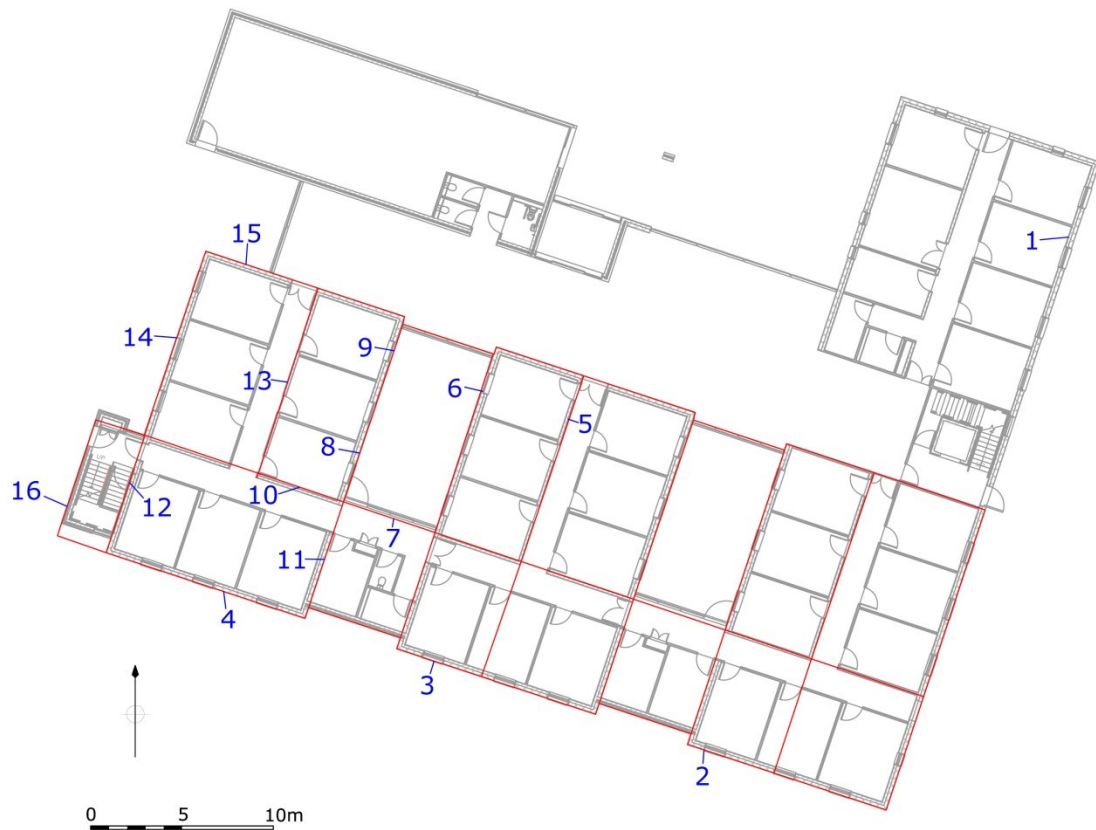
Ground floor plan of the new building with footings in red and showing locations of recorded soil profiles.
